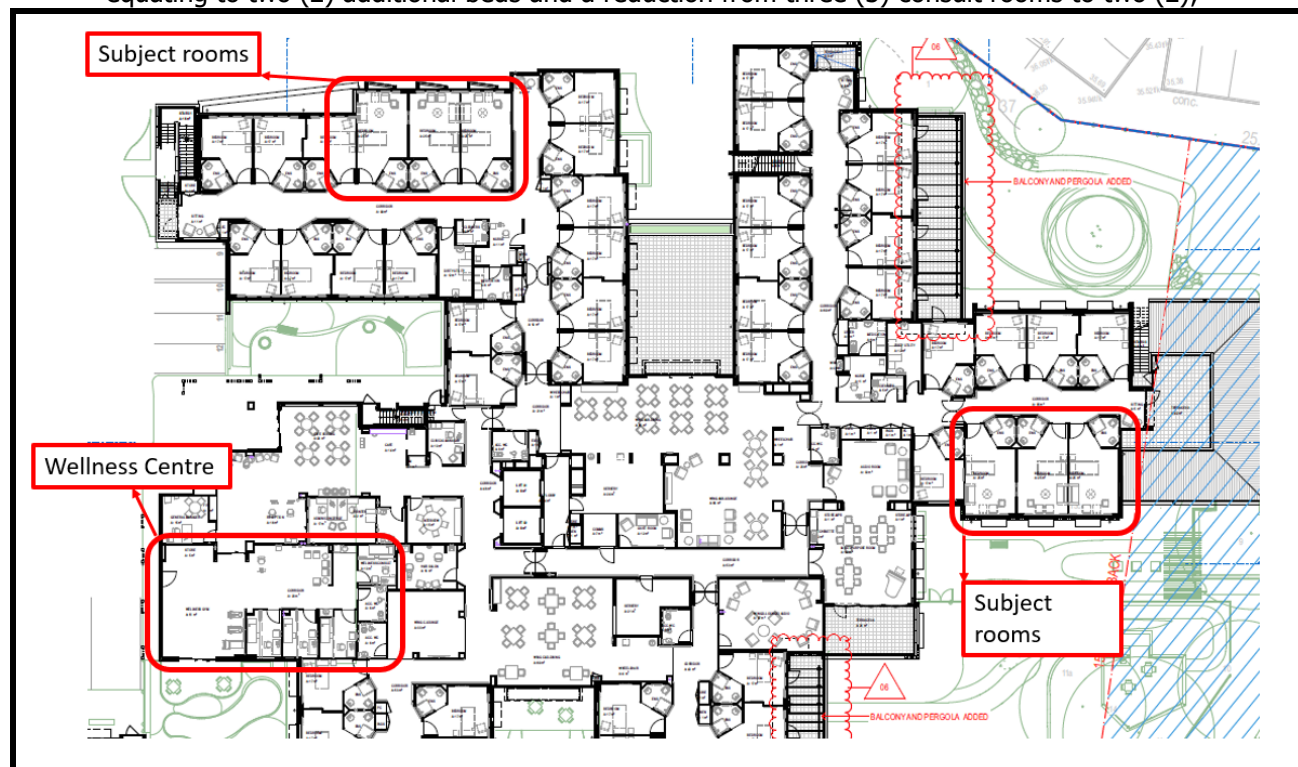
Existing approved ground floor plan (Source: Calder Flower)
